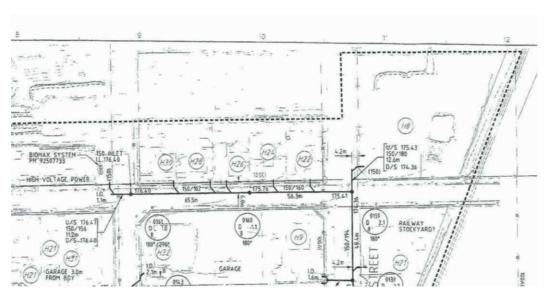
Extract from Sewer Infill Plan for Macartney and Grey Streets
